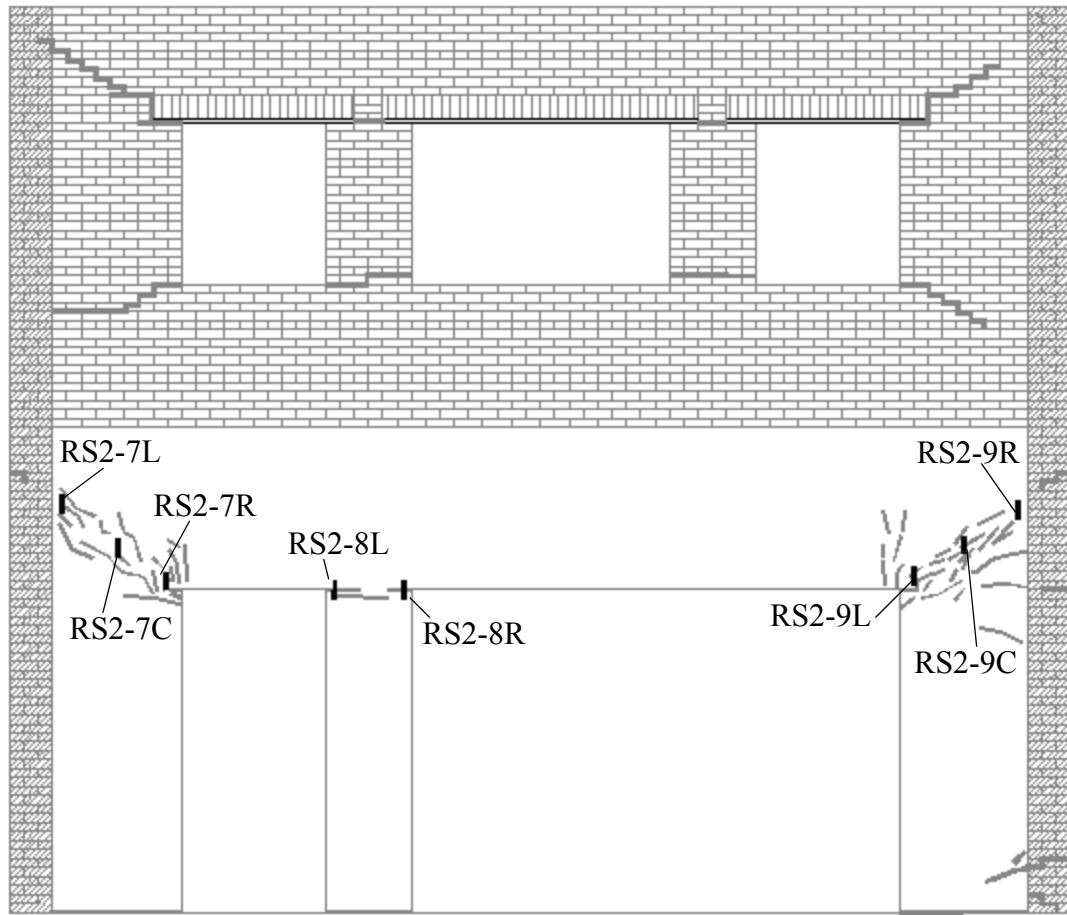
Elevation of Wall 2 illustrating the location of strain gages attached to the external reinforcement system.
